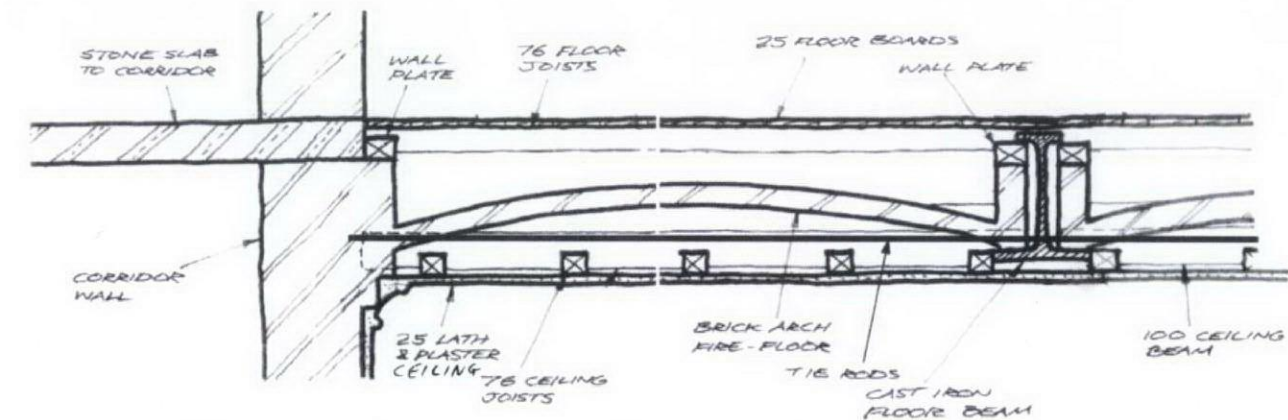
Typical section through Jack Arch Floor (SK081 & SK082)
